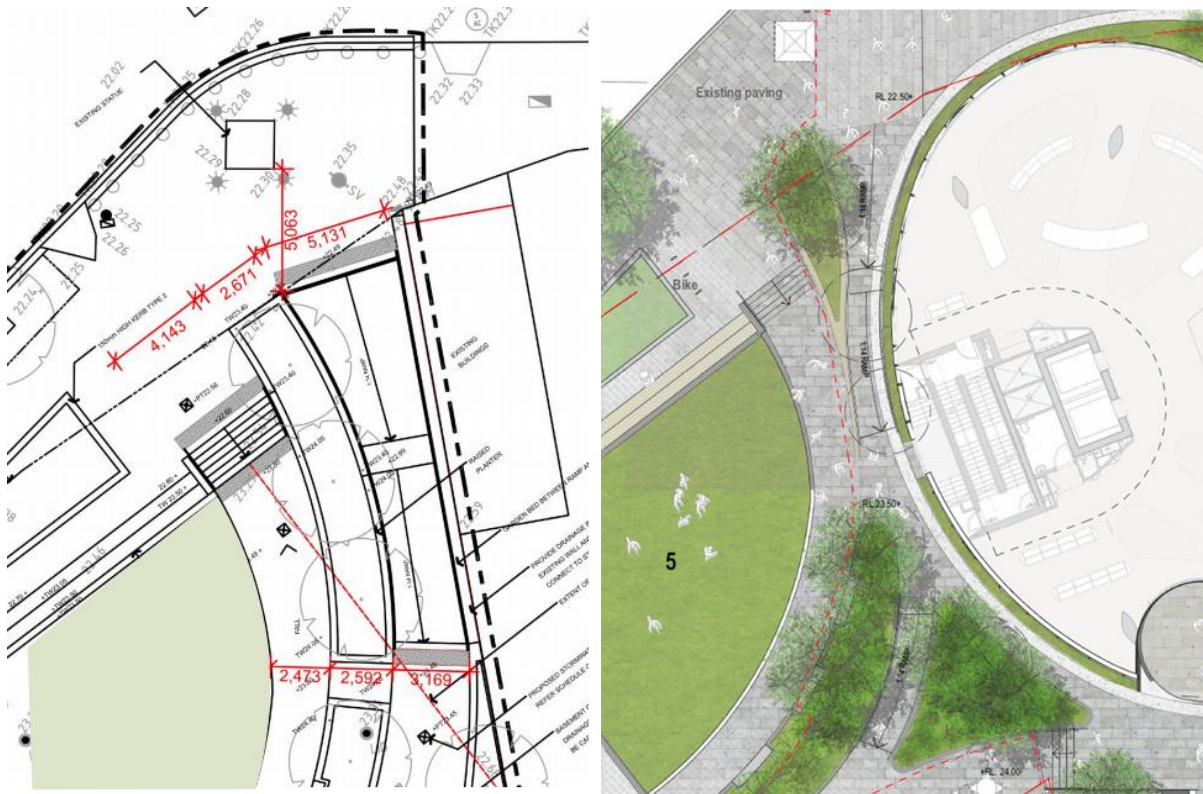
Existing ramp shown on the left and proposed ramp shown on the right
